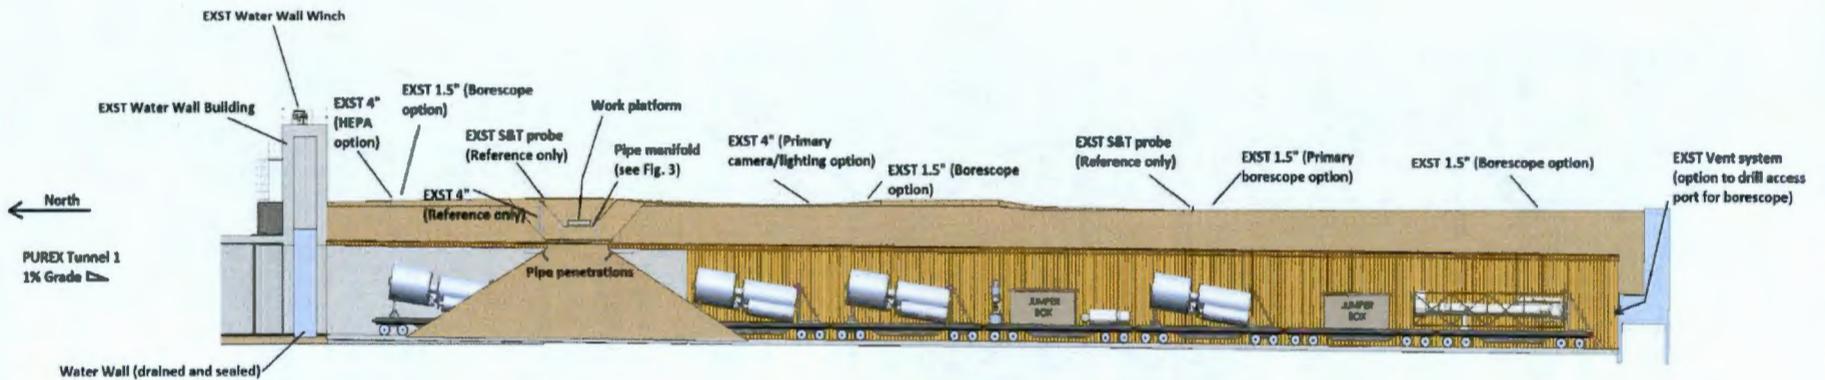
West Elevation of Tunnel Number 1 with Equipment Placement
